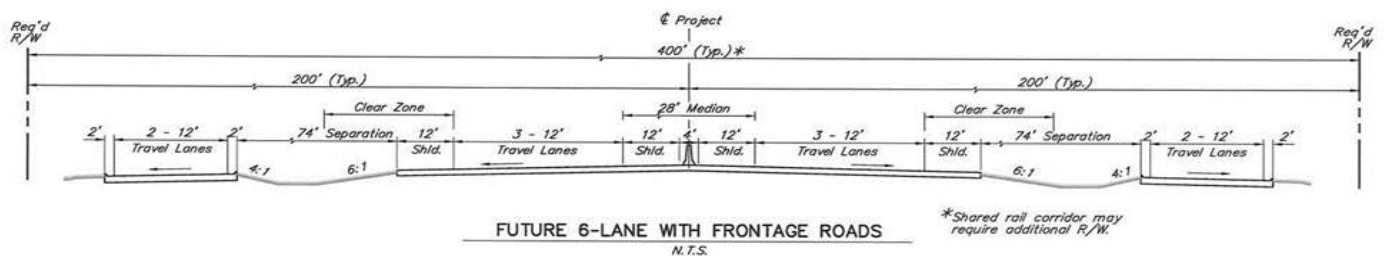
Proposed Typical Section of Expanded 6-Lane Highway with provisions for Frontage Roads (Source: Baton Rouge Loop Tier I EIS)
